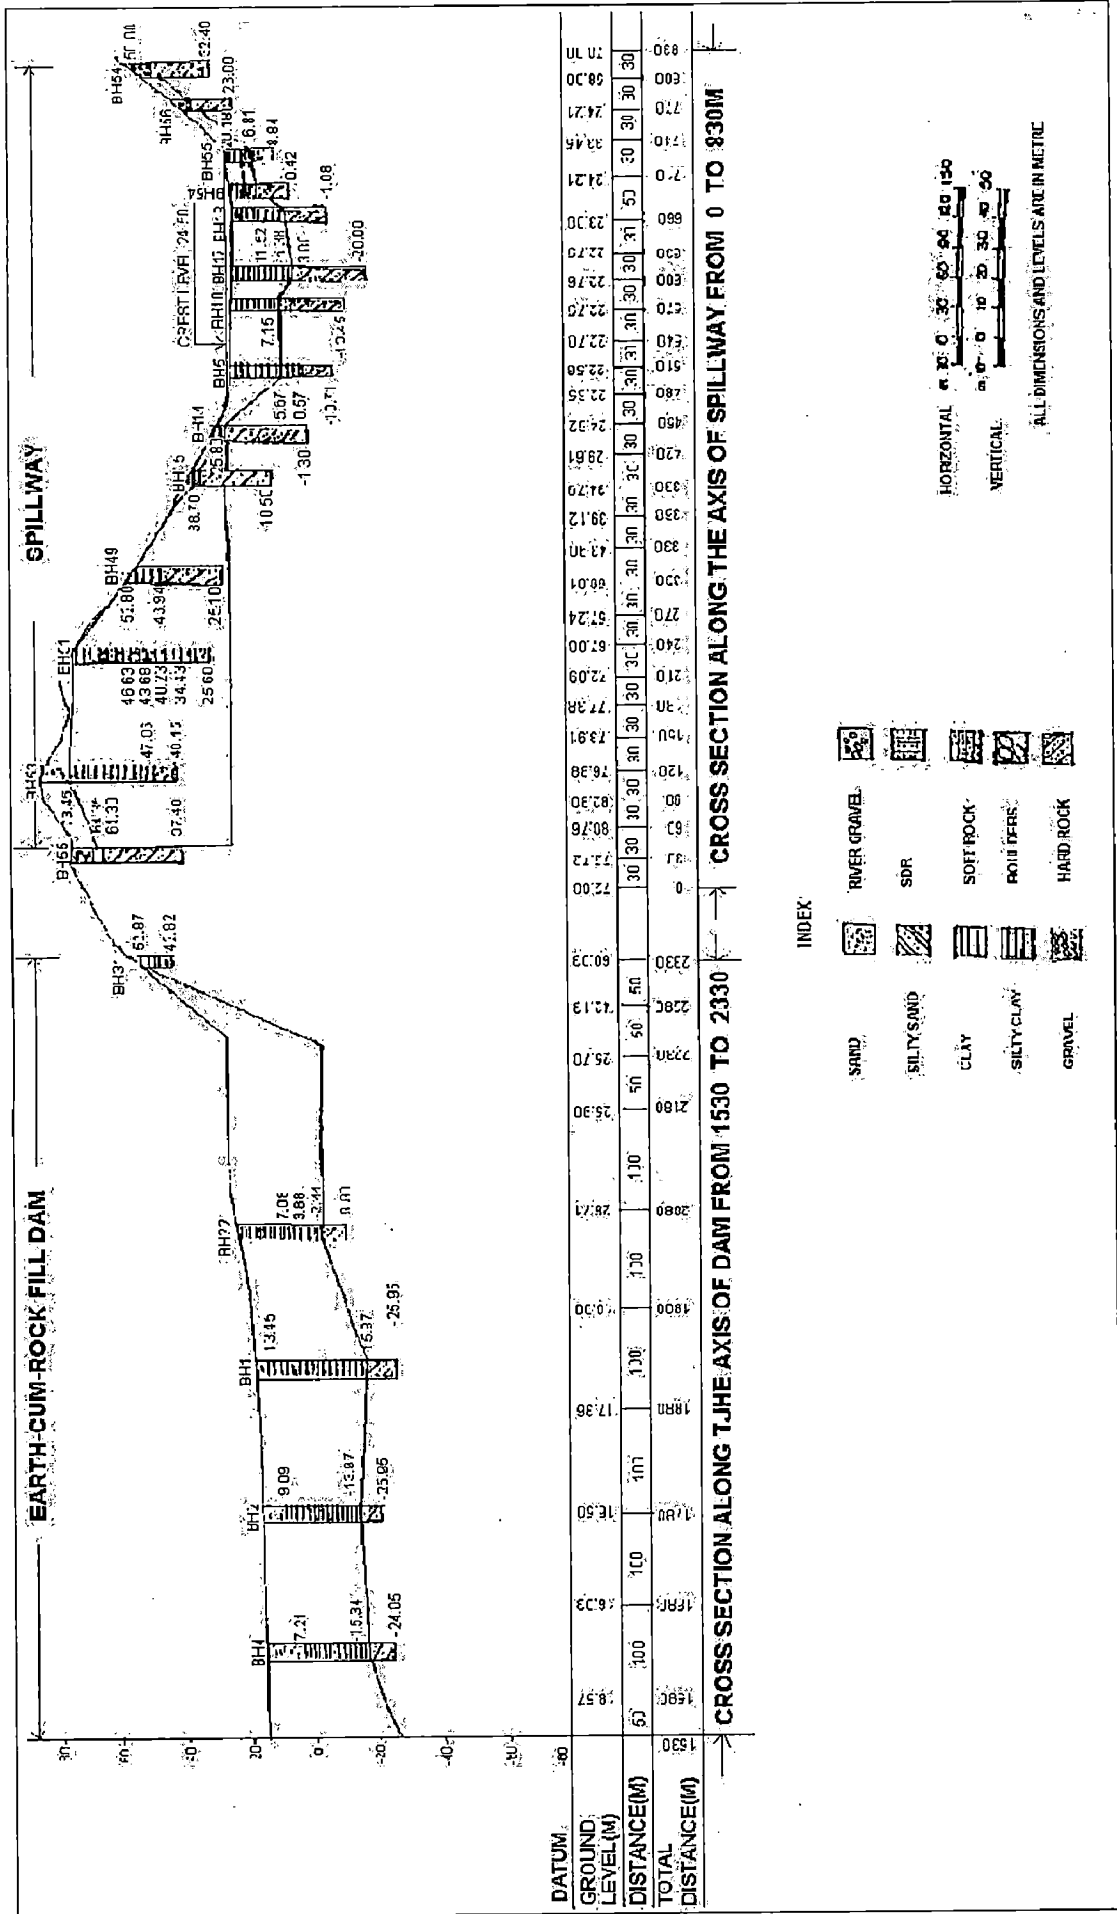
Cross-Section and Bore Well Details of Polavaram Dam Site
